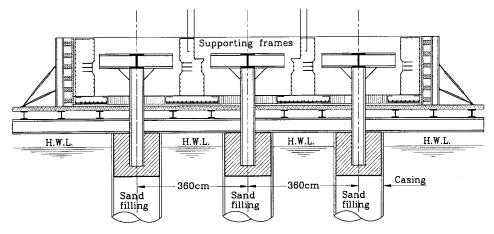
Erecting Frames and Fixing Steel Reinforcement of Bottom and Sides of Pile Cap
